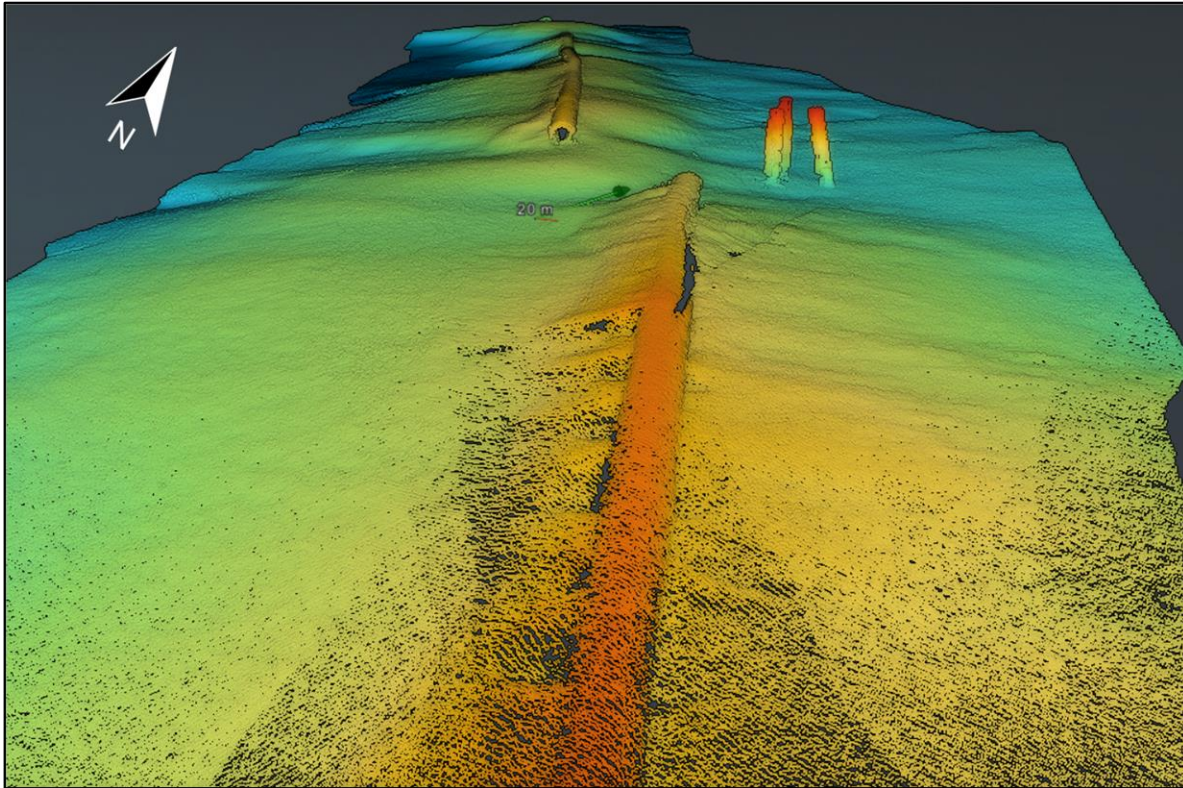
3D hillshade detail of City of North Bend sewer outfall – Airport (from southeast)
